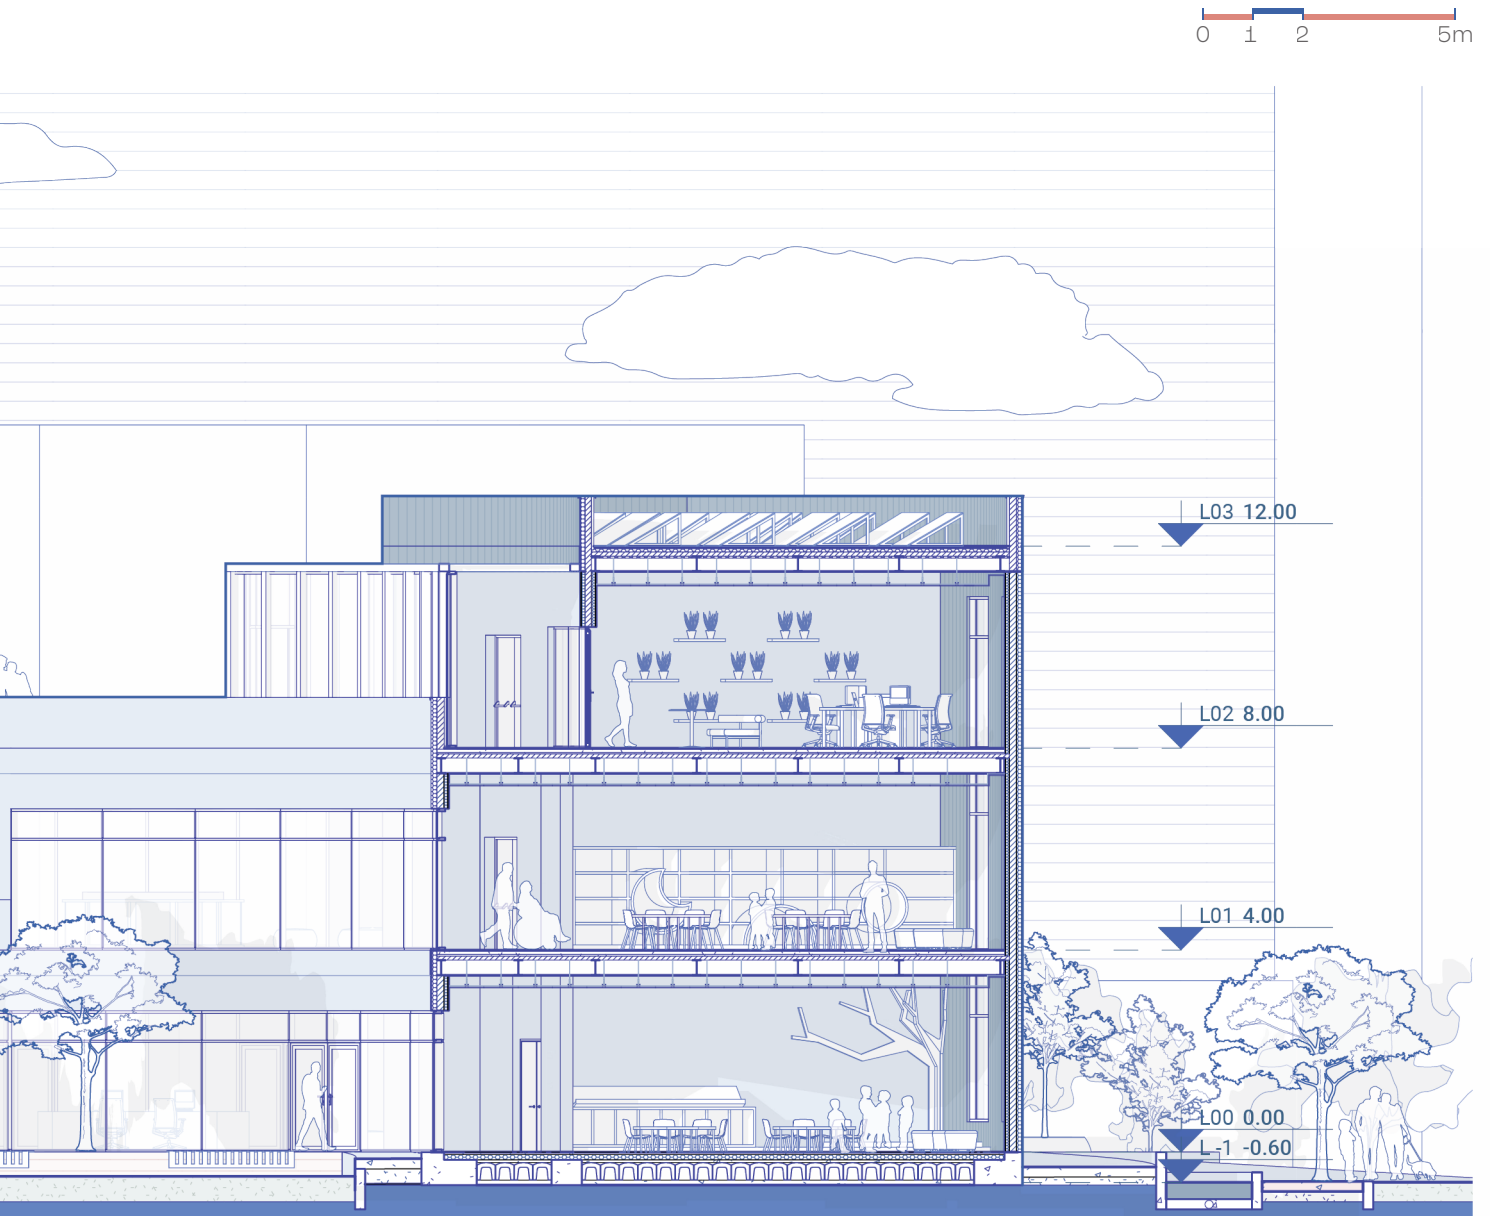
Section B - B. Scale: 1:150. Made by the author.
